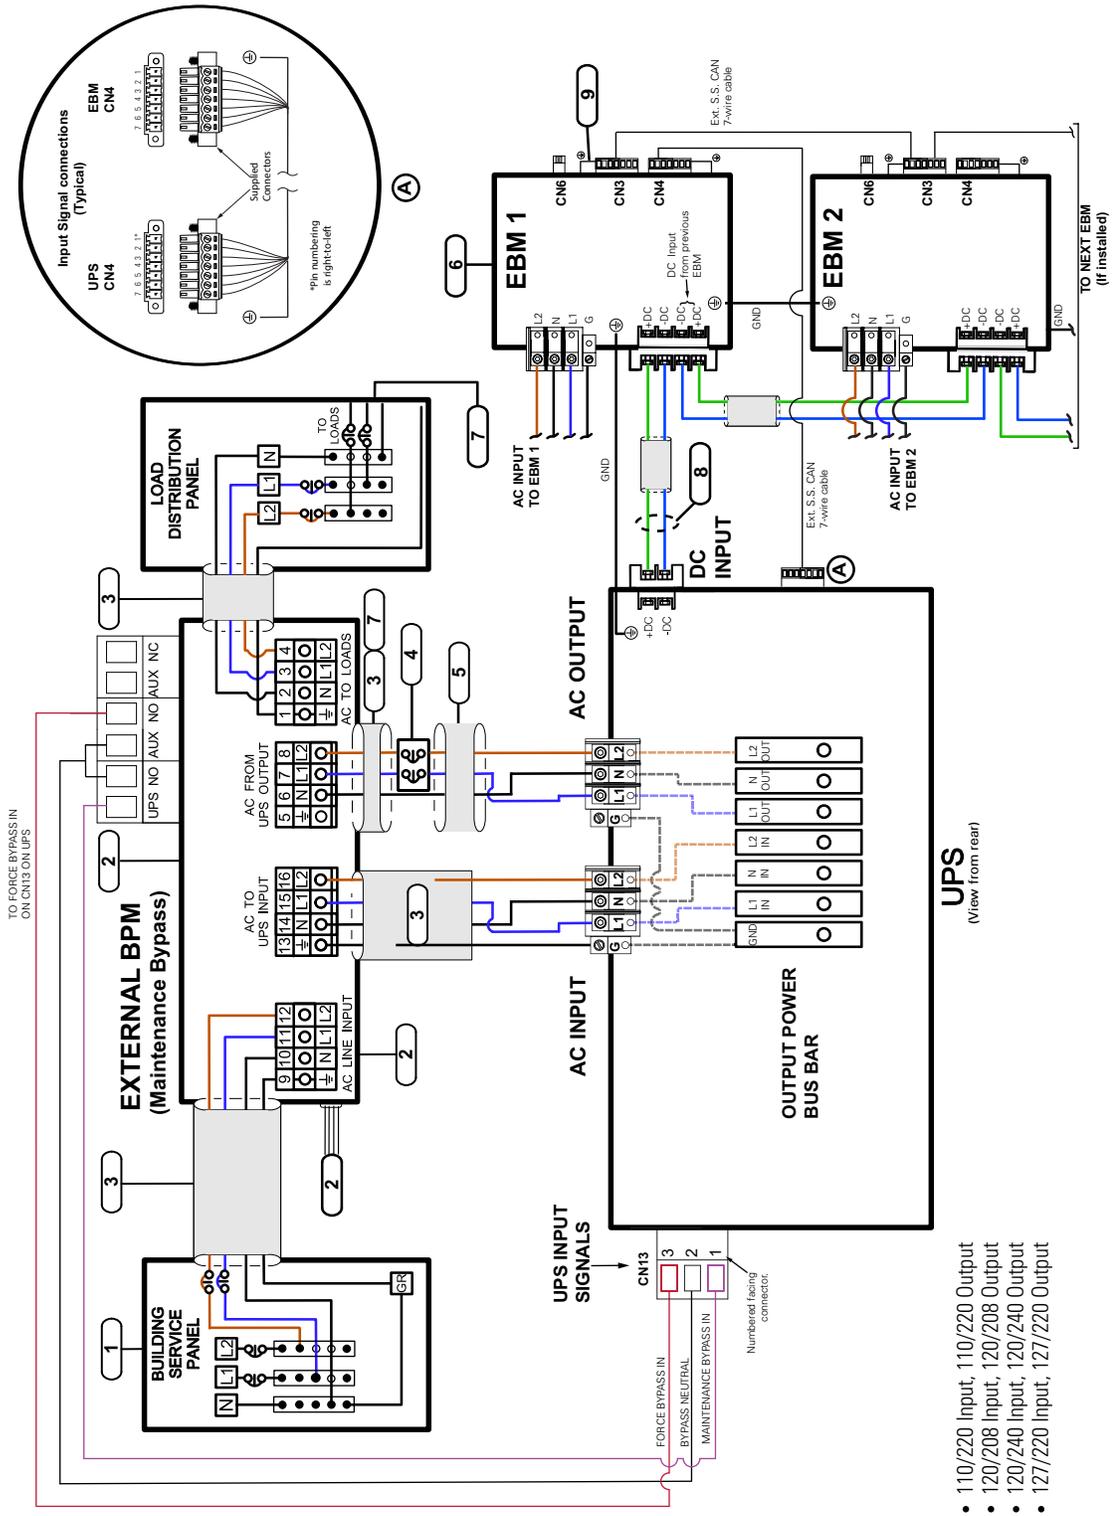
Wiring Diagram - UPS with External Bypass Switch (L1, L2, N)
